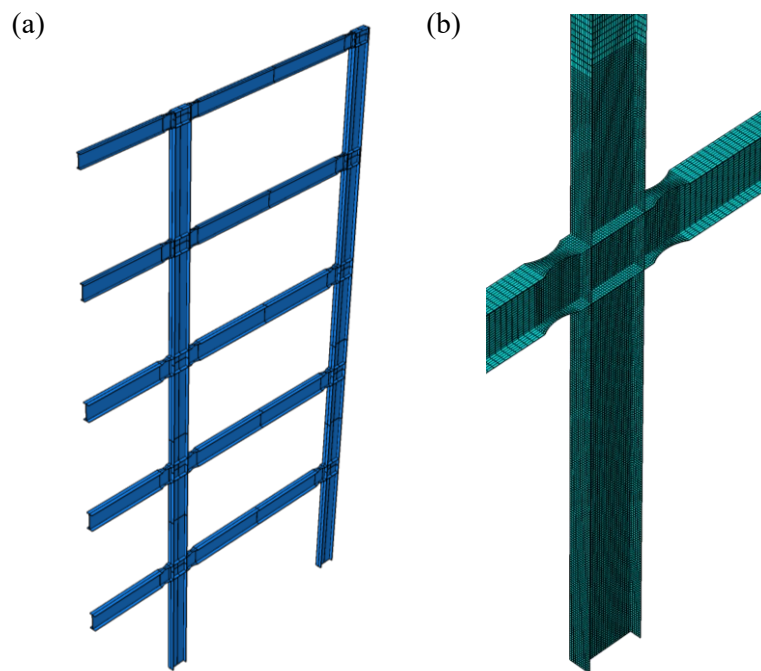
(a) MRF subassembly (elements are not shown); (b) CFEM of the beam-to-column connection.
